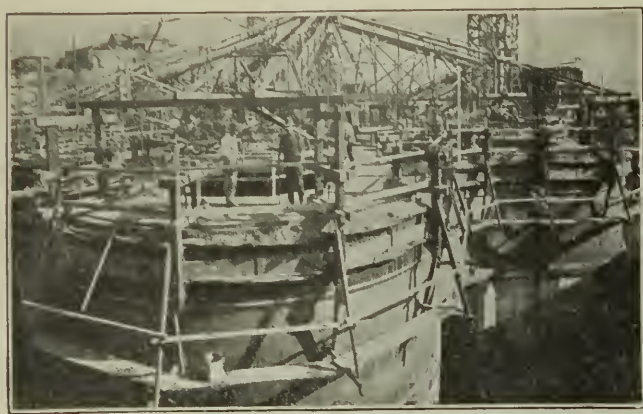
LONG FORM YOKES SUPPORT FINISHING SCAFFOLD AND TRUSSED BEAMS OF CHUTING SYSTEM
